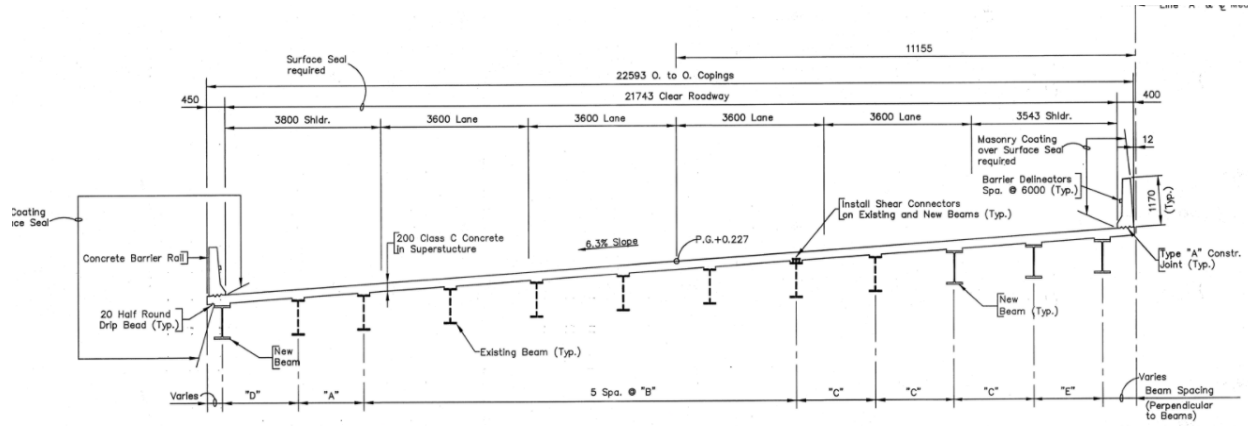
Typical Section of the Bridge (NBI 36890) (2001)
